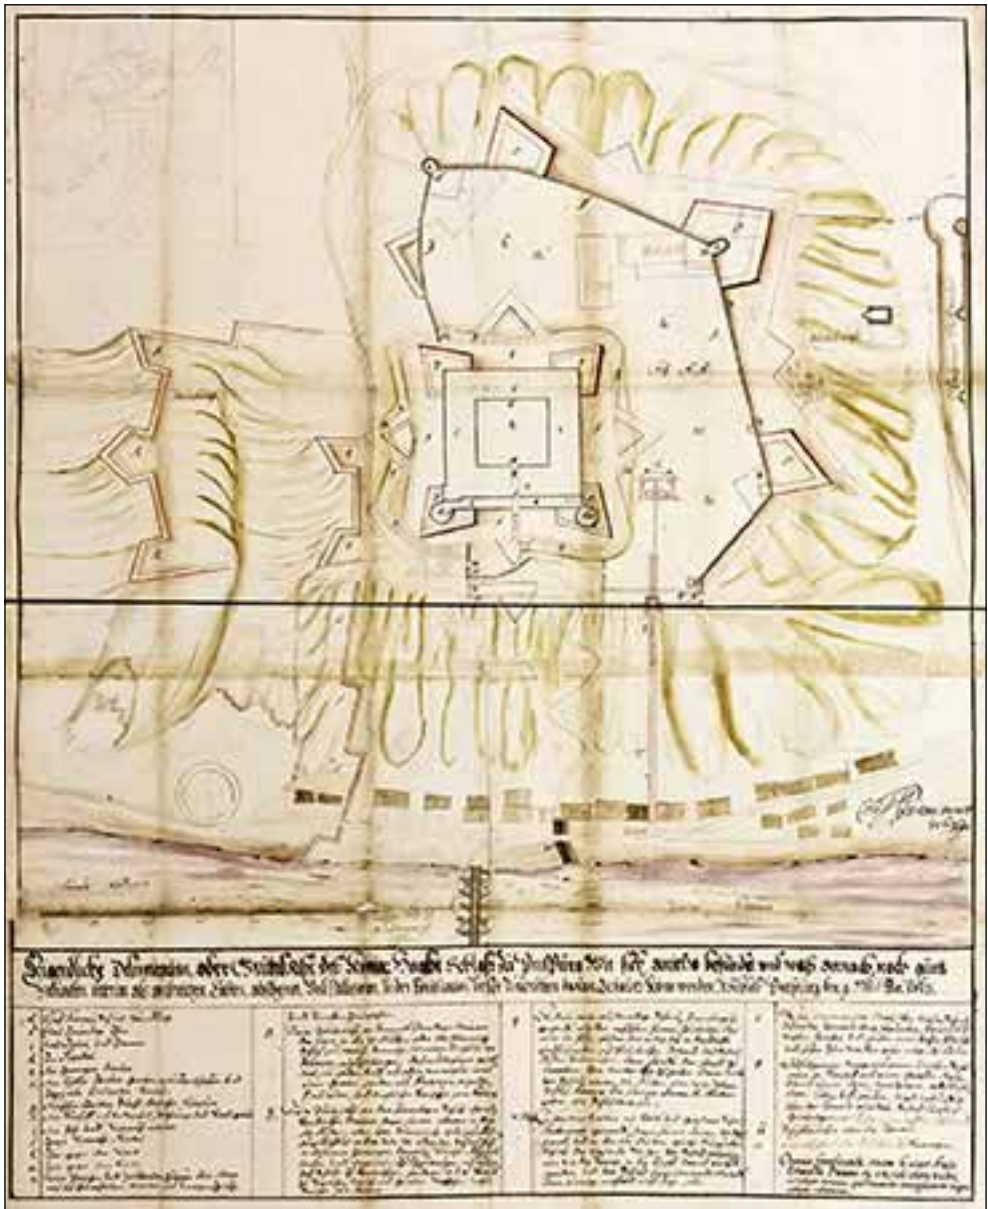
Joseph Priami's plan to fortify the Pozsony Castle, September 9, 1663
